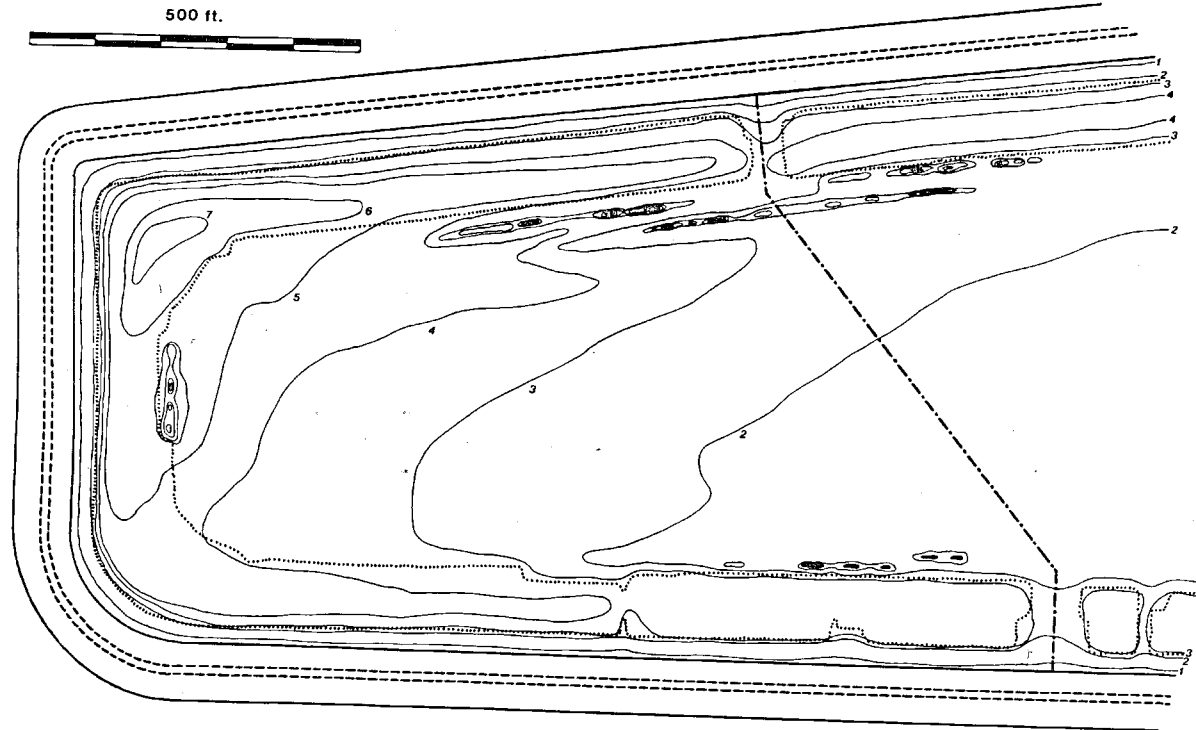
Containment area isobaths. Isobaths of the sediment surface in Containment Area No. 85 prior to shrimp pond construction. The slumping of sediment into borrow ditches shows the positions of gaps or bridges across the ditches. The route of the internal levee across these bridges is shown by the dashed line.
